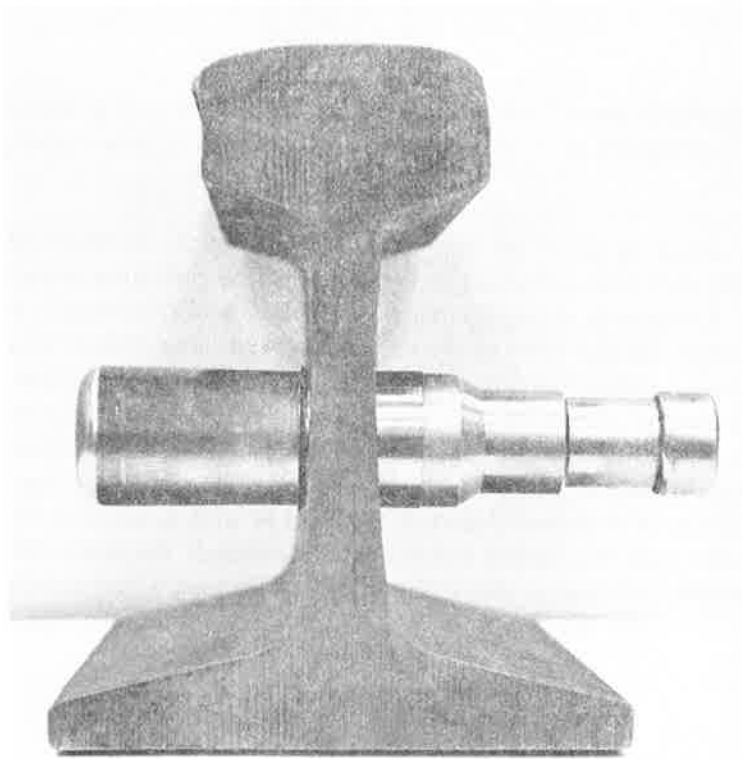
Mandrel and Sleeve Properly Seated in Bolt-Hole Bore
